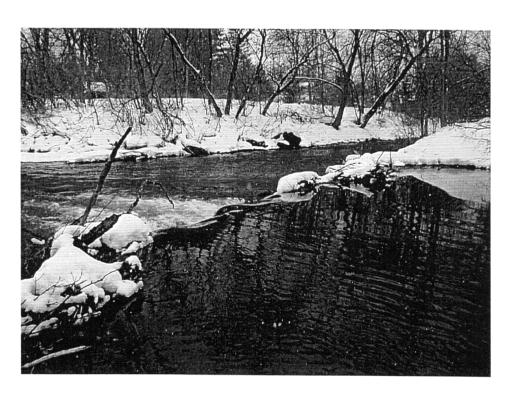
View of Dry Creek outflow dam structure. View from north side of dam with Dry Creek outflow in background.
